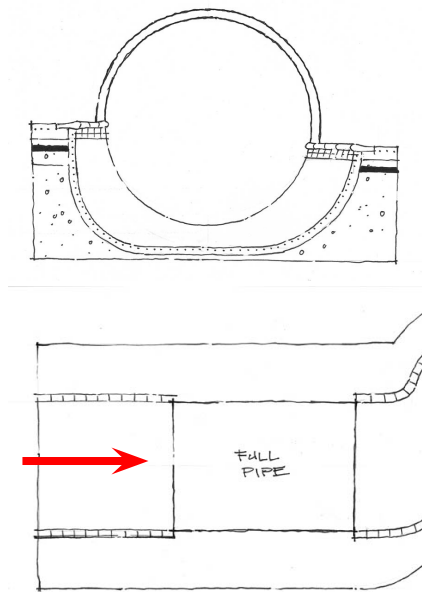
Fullpipe in section, A fullpipe in plan, combined with a halfpipe.
